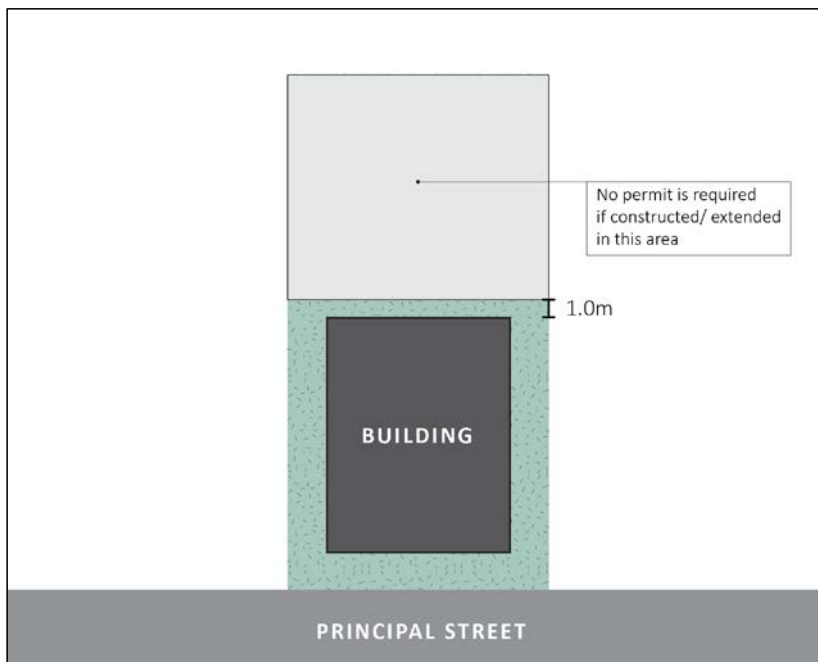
Construction or extension of an outbuilding is exempt if located in this area
